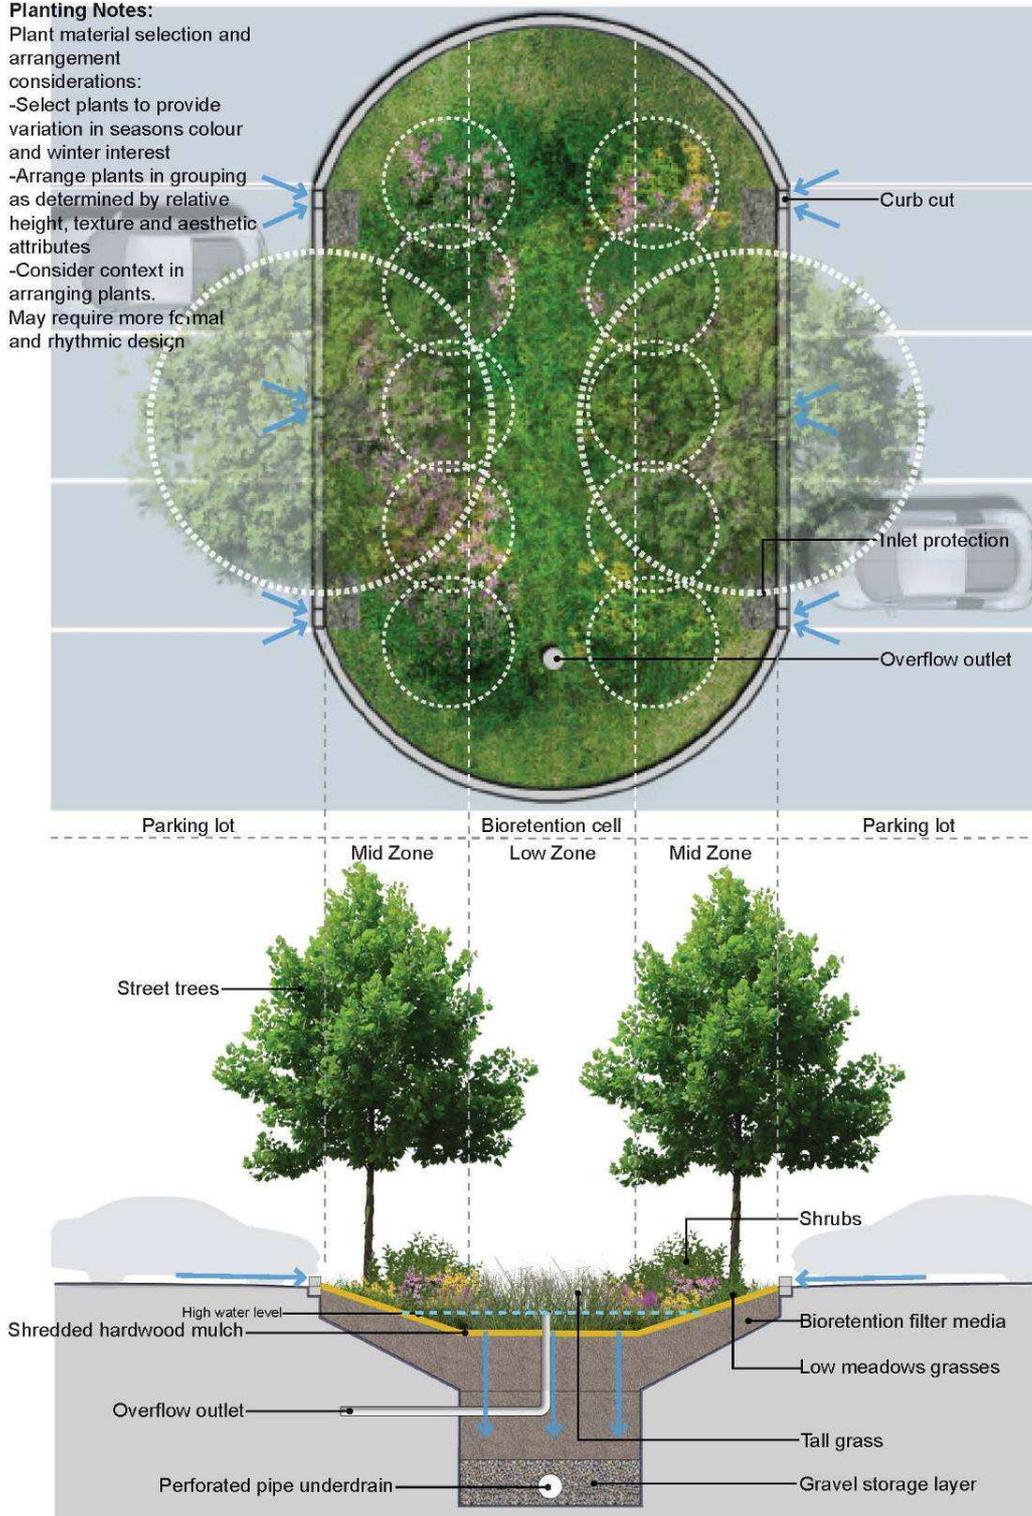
Bioretention cell plan view and cross-section; sizing and layout guidance is provided in the LID Stormwater Management Planning and Design Guide.
